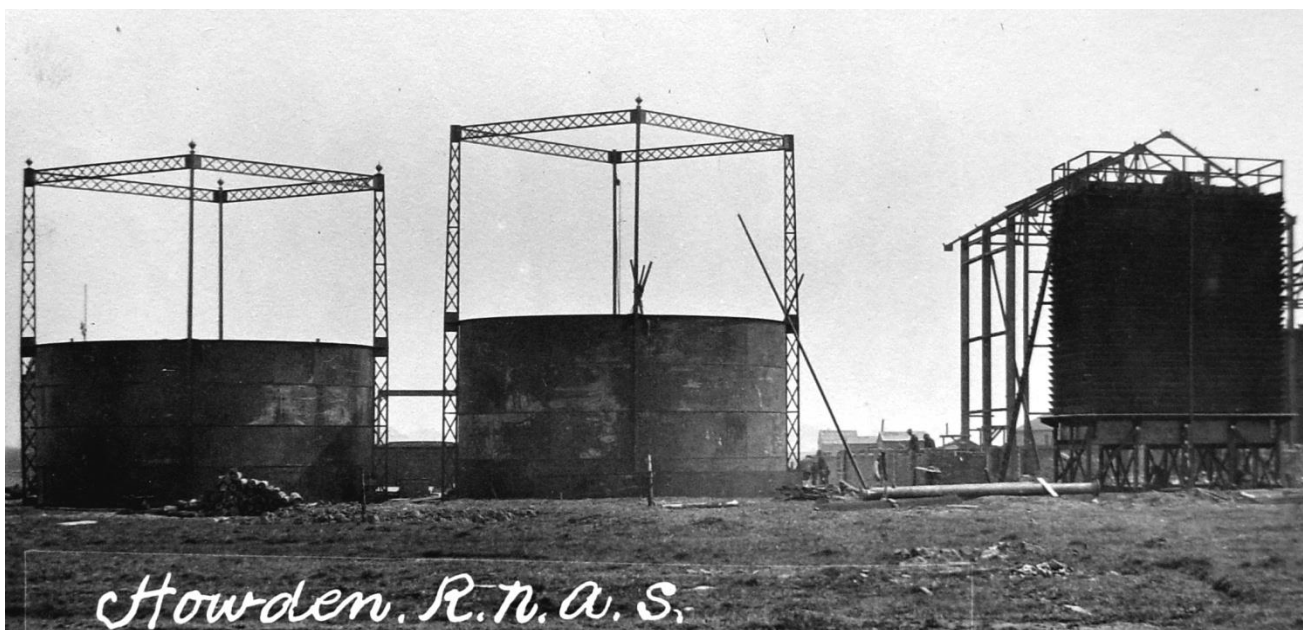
Hydrogen gas plant and cooling tower 15-5-18
